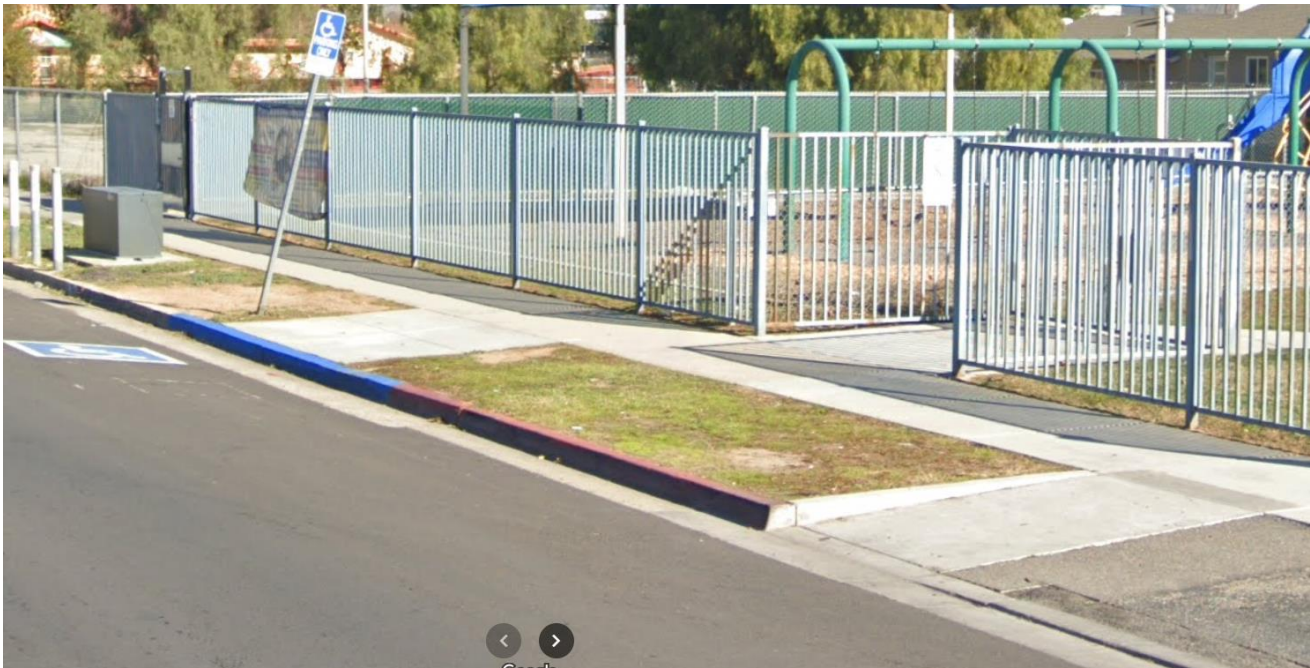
Existing accessible on-street parking space at Arlanza Elementary School
